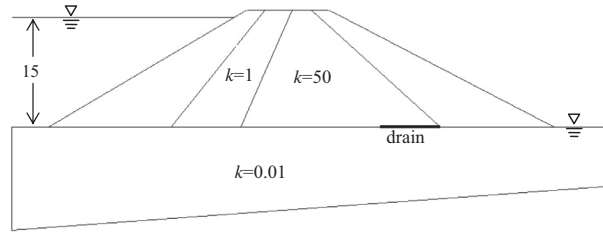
A dam with sloping core and horizontal drain on a slightly permeable foundation.
